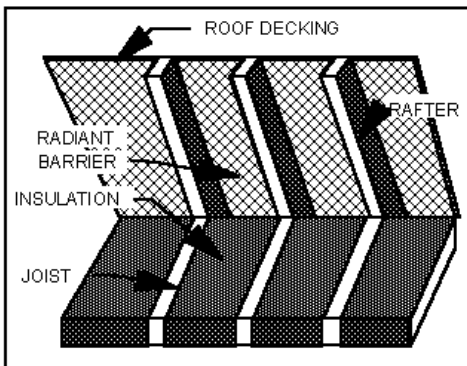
Radiant barrier laminated to roof decking (courtesy of Oak Ridge National Laboratory)
